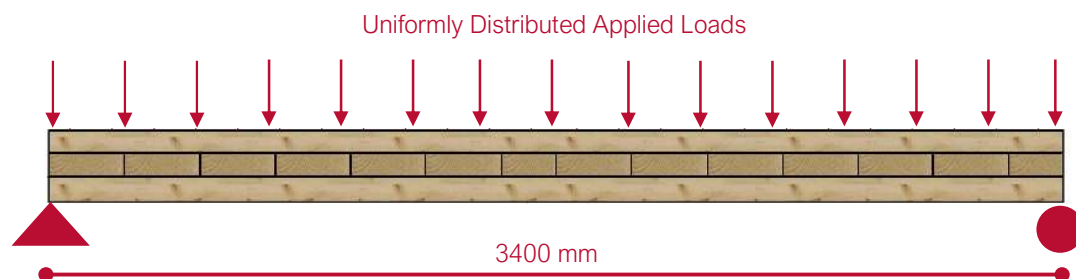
Simply Supported Red Stag CLT Floor Panel Elevation
